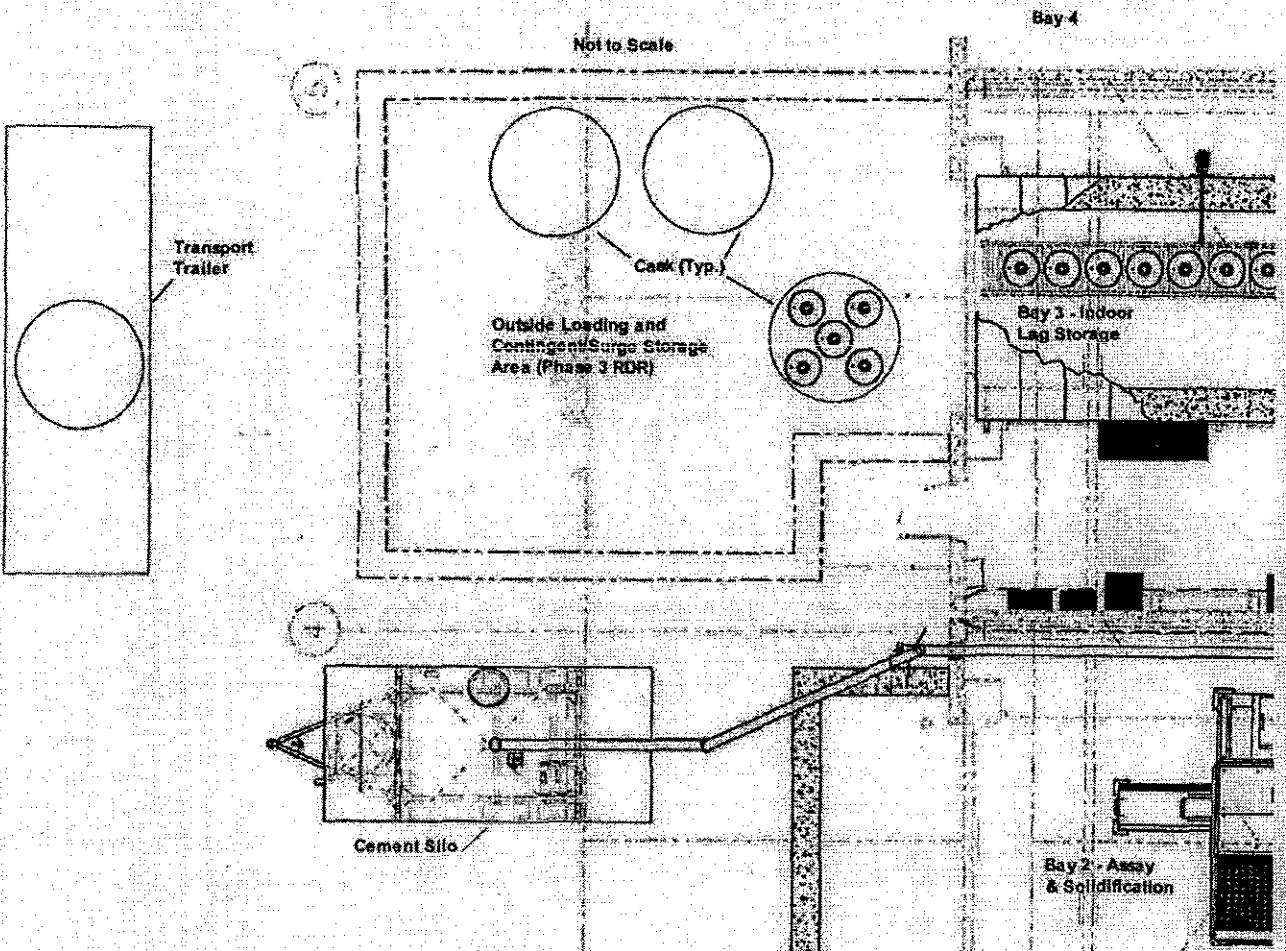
CVDF Outside Loading and Contingent/Surge Storage
